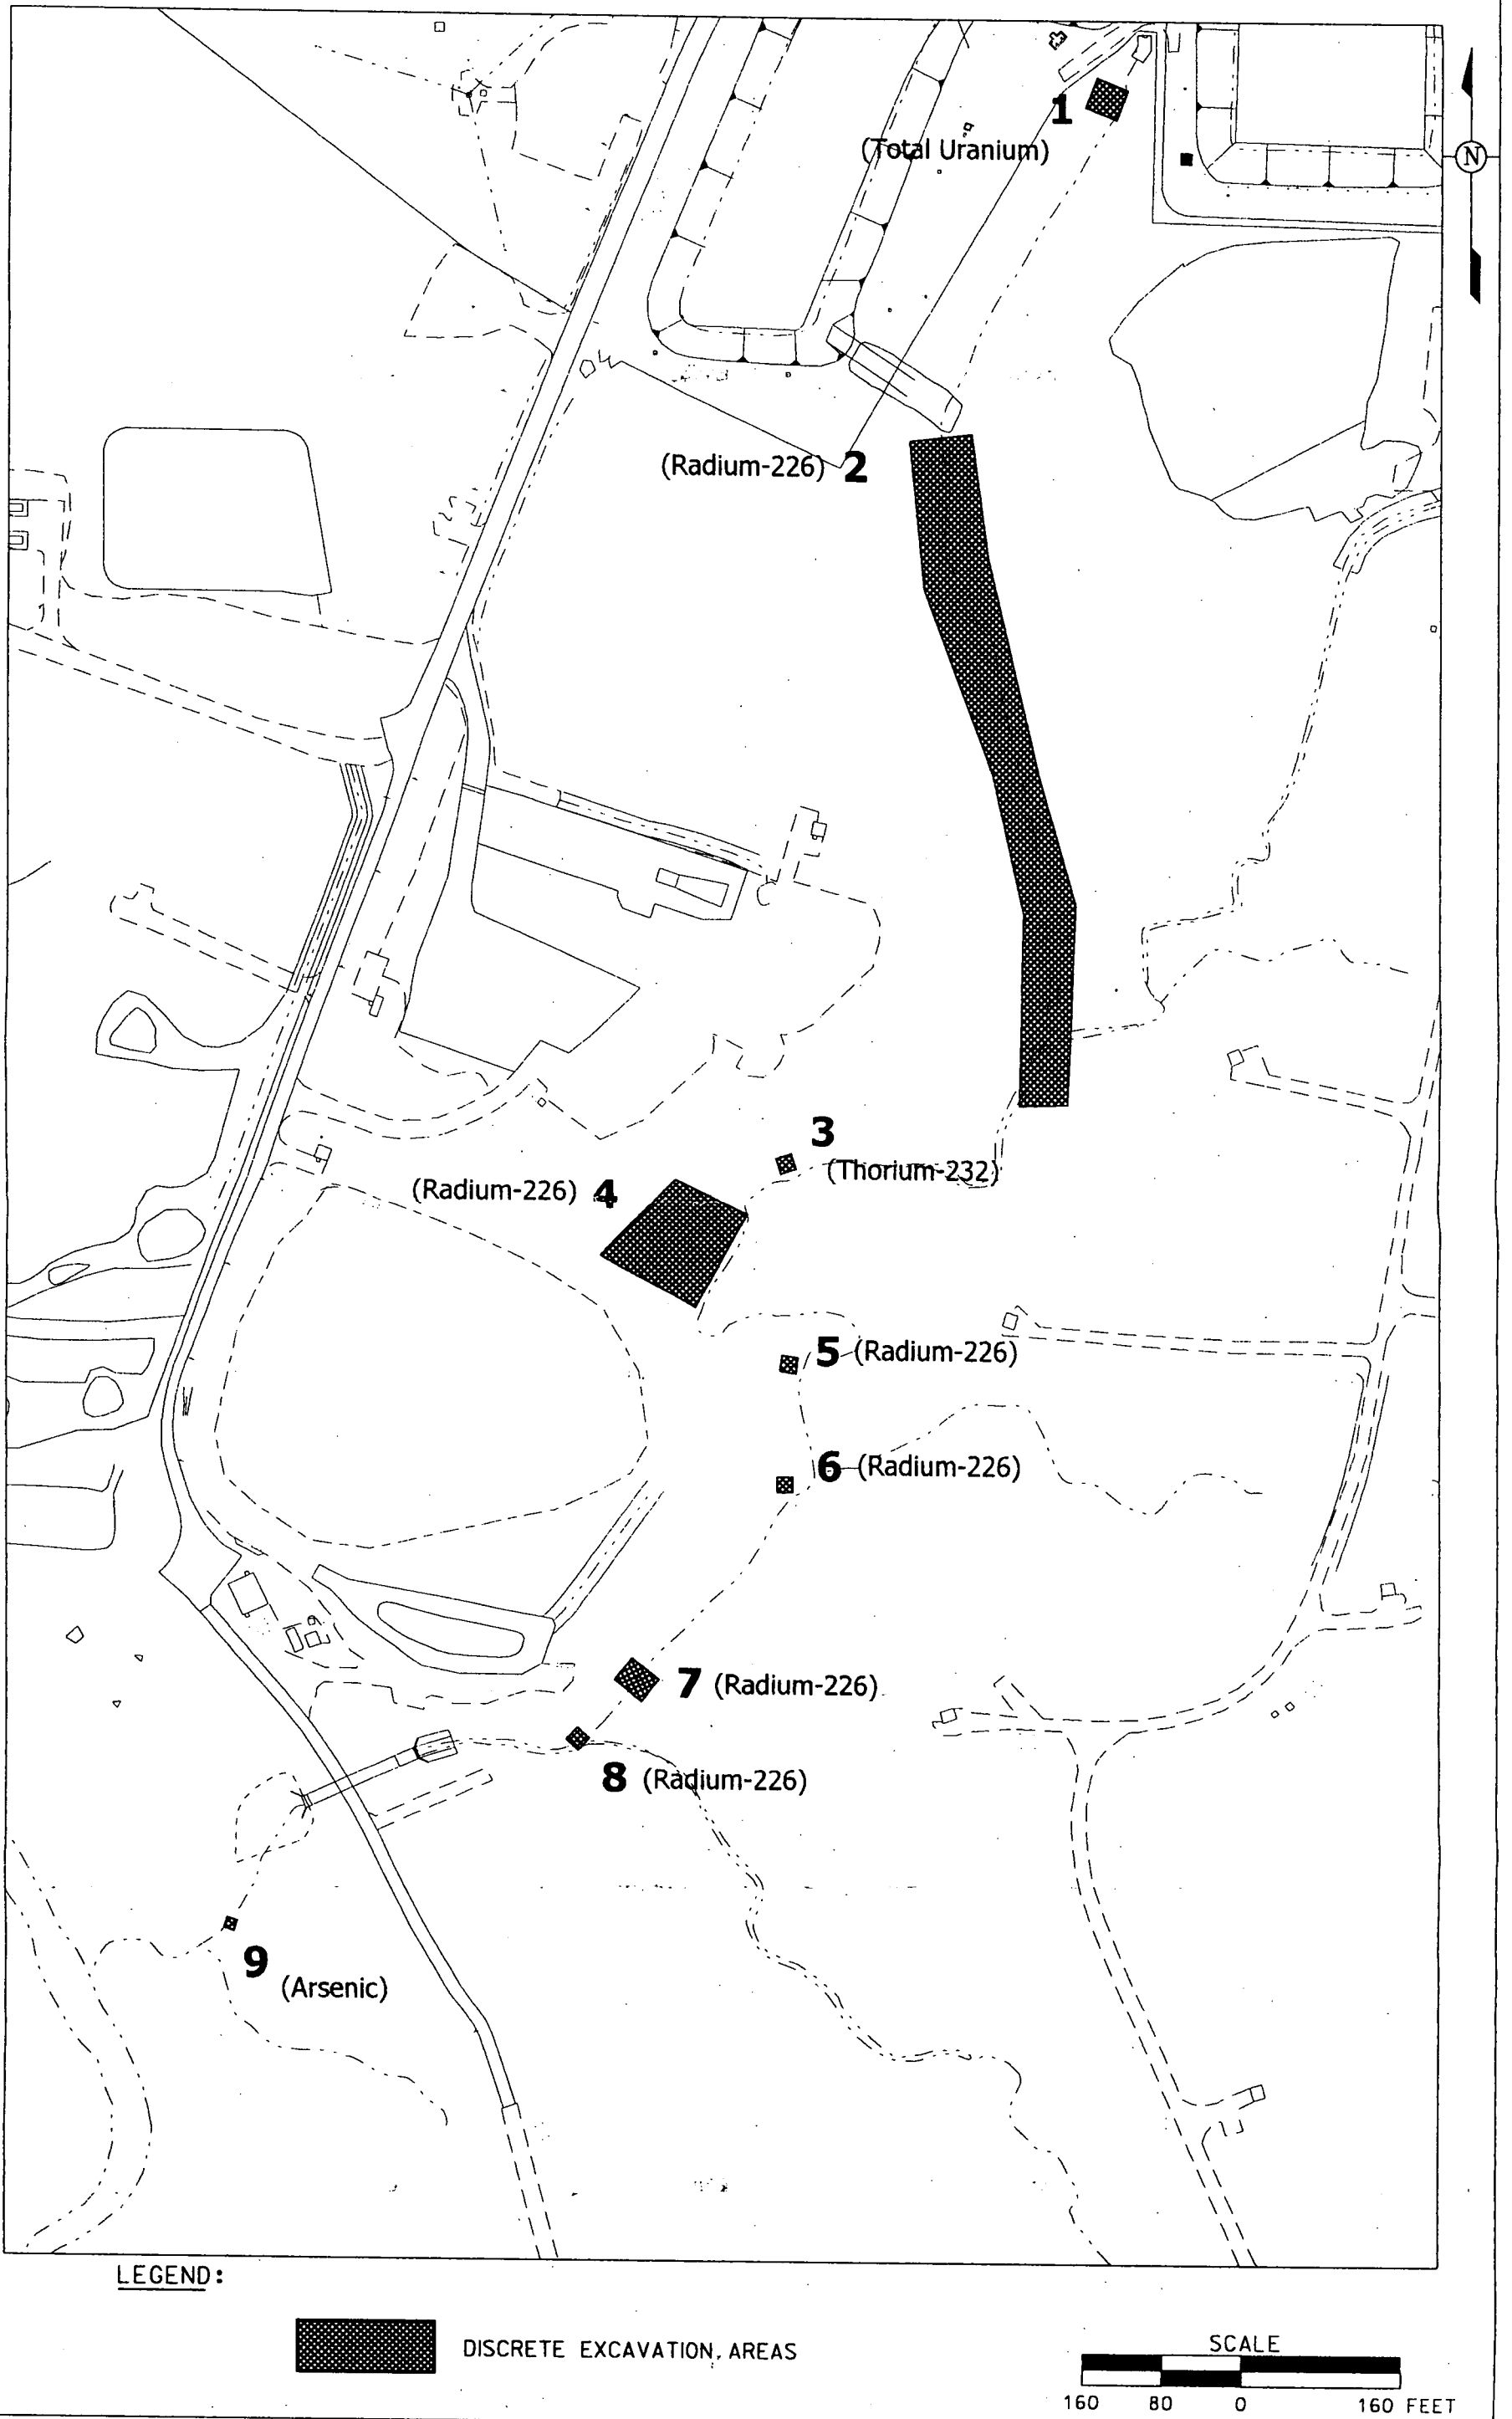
STORM SEWER OUTFALL DITCH - EXCAVATION CONTROL AREA
